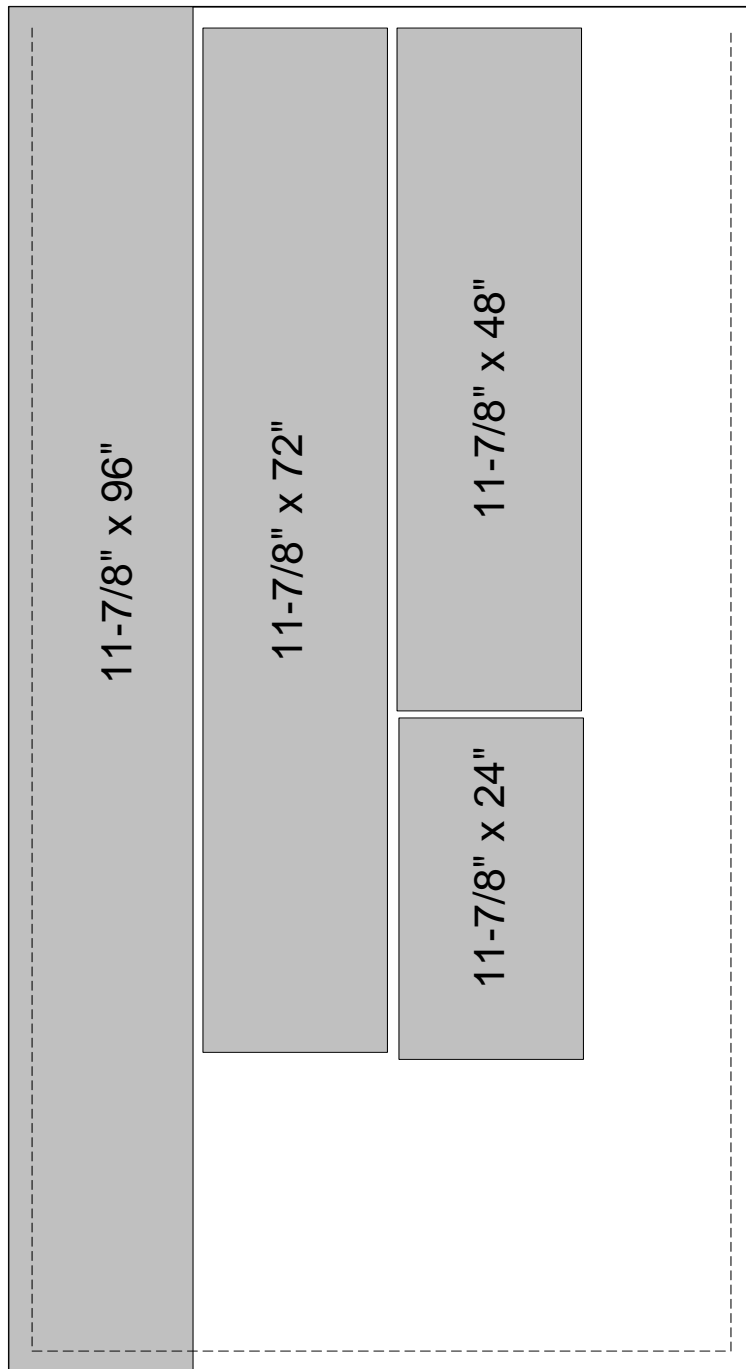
TRANSVERSE LOAD TEST SPECIMEN AND ASSEMBLY
